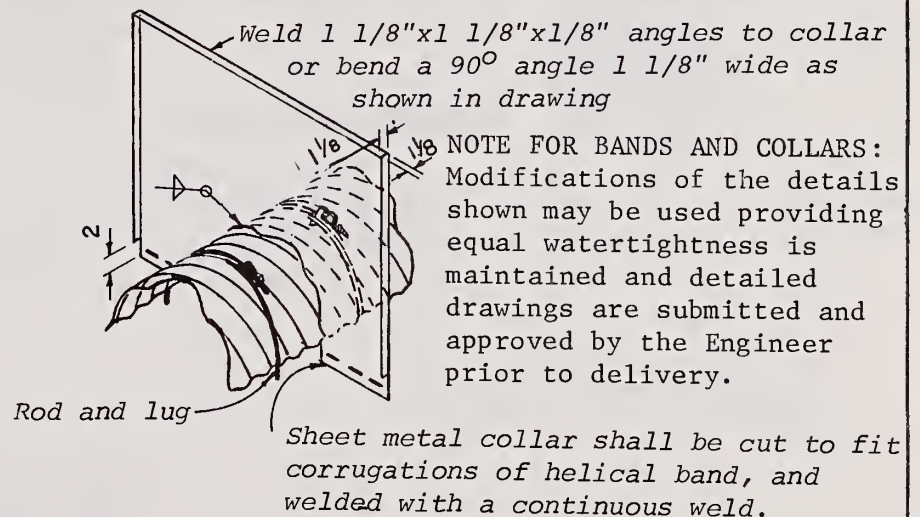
DETAILS OF CORRUGATED METAL ANTI-SEEP COLLAR
